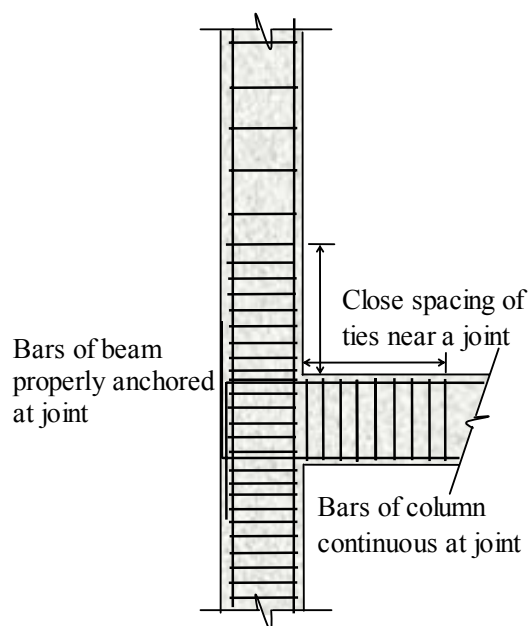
Ductile detailing of reinforcing bars at a beam-column joint
